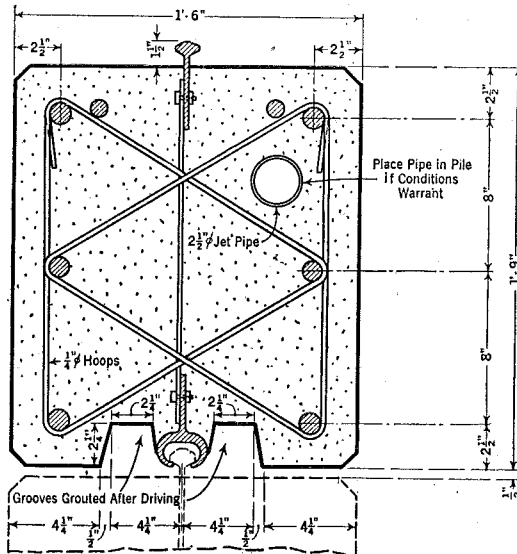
A SPECIAL TYPE OF REINFORCED CONCRETE SHEET PILE USED FOR A CUT-OFF WALL NEAR THE RIVER MISSISSIPPI.
